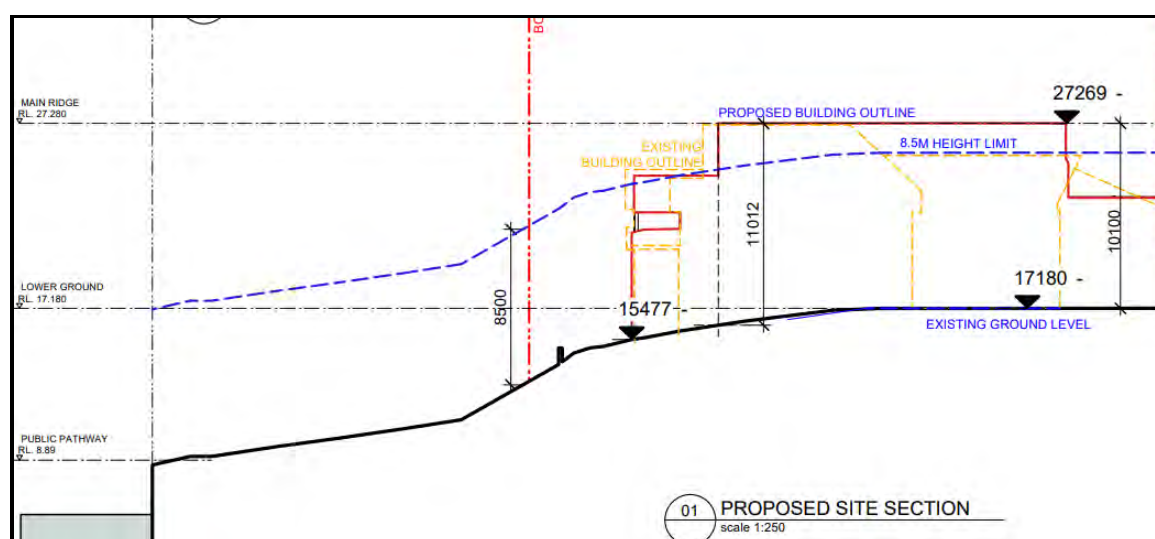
Section of building showing the 8.5m maximum height limit, existing building outline and proposed building outline Plan 404 Rev D (Source: Quattro Architecture).
